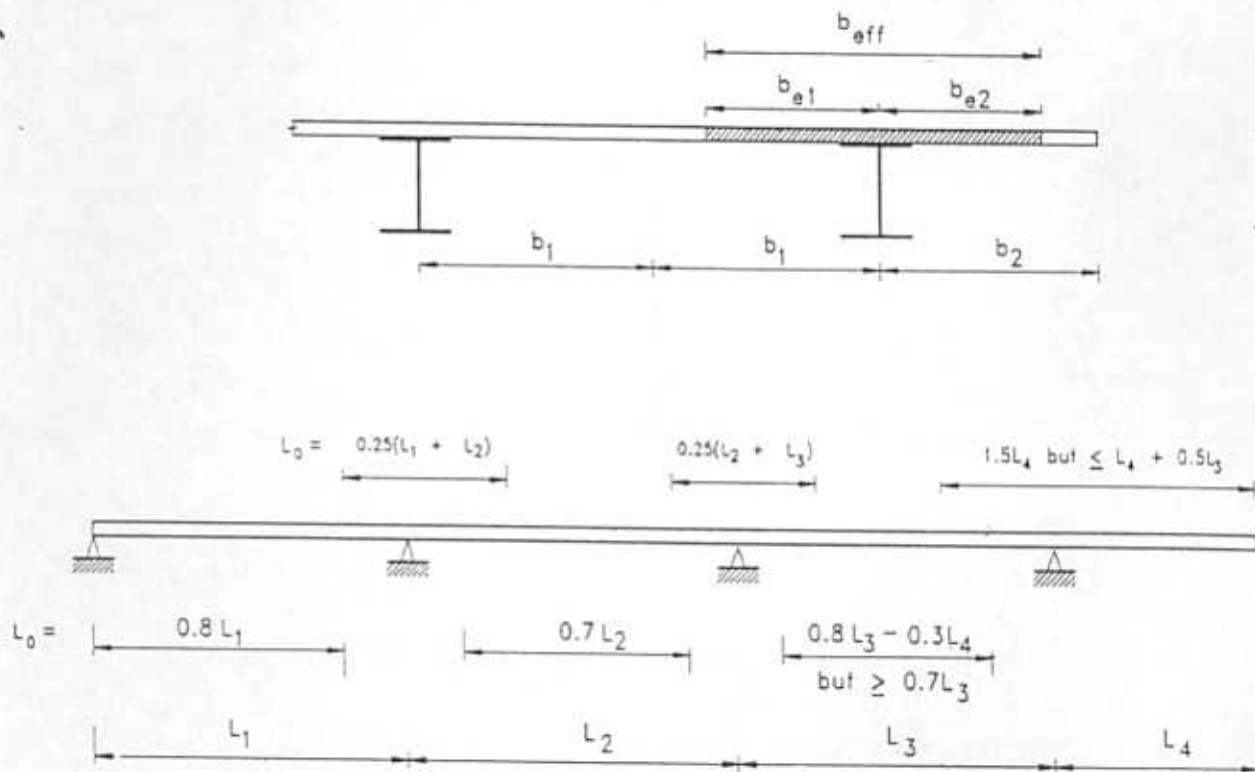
Equivalent Spans, for Effective Width of Concrete Flange
